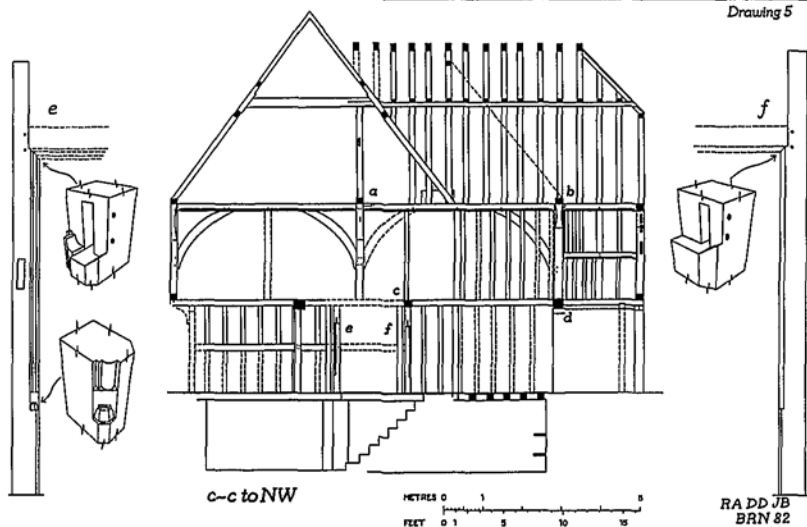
No. 26 St. Peter's Street: Section (Scale: 1:200) and Details (Scale: 1:40).
